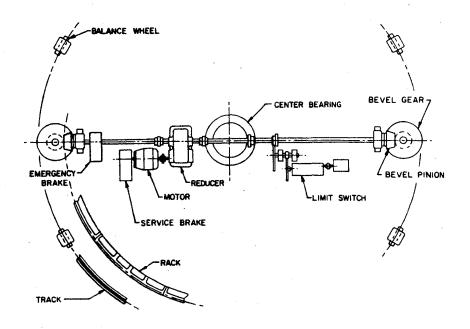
Layout of Center Bearing Type Swing Span with Machinery on the Span
